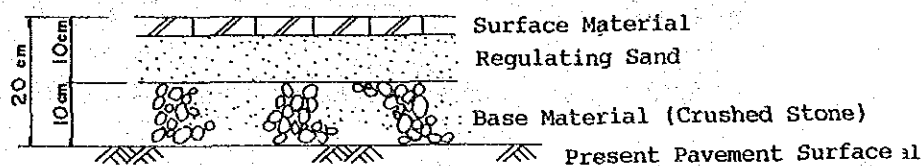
PAVEMENT CROSS SECTION
